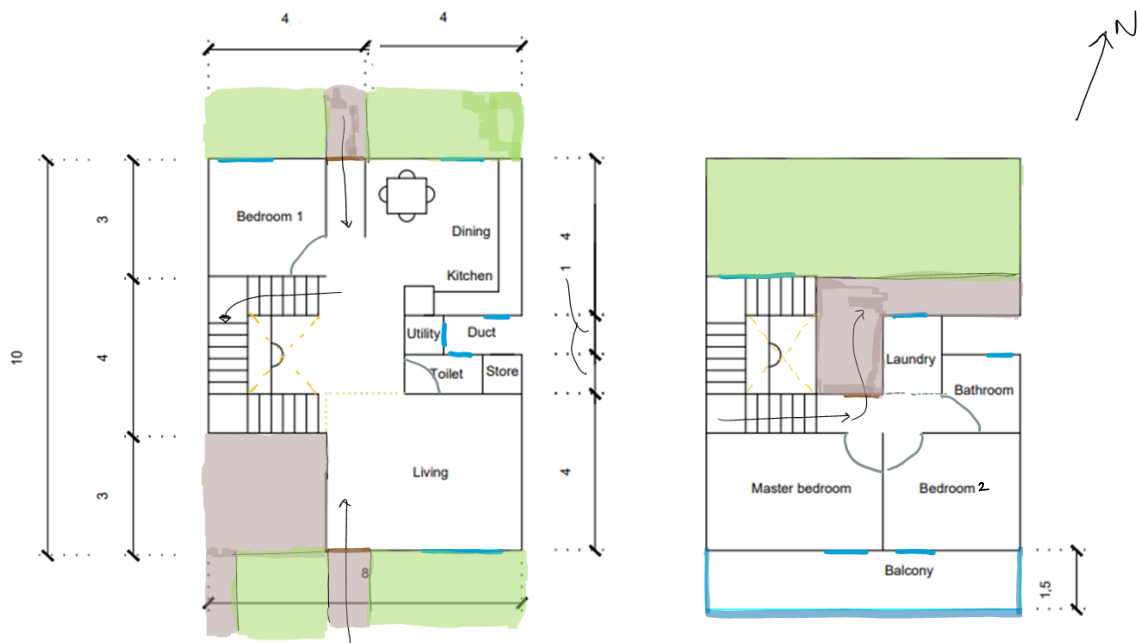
Three-bedroom house floor plans - ground floor plan (left), first floor plan (right)
